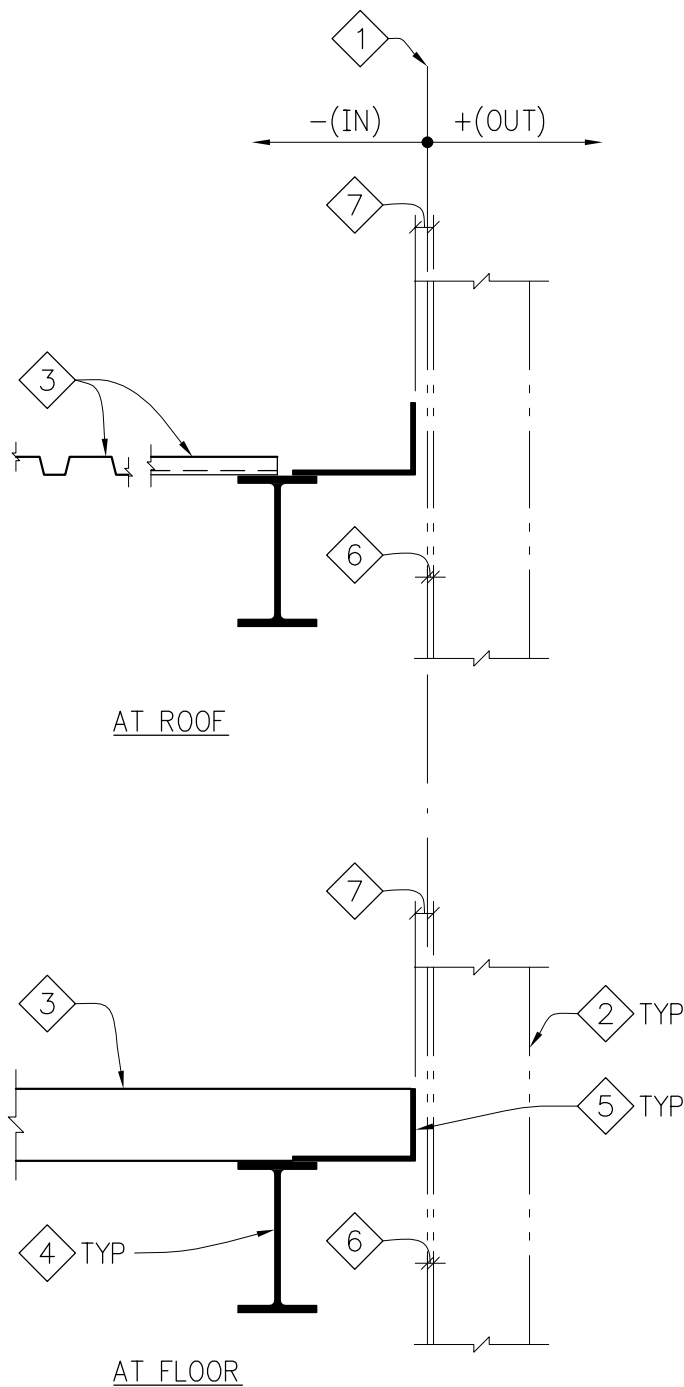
METAL STUD ENGINEERING ISSUES - CASE C: STRIP WINDOW CENTER PANELS
